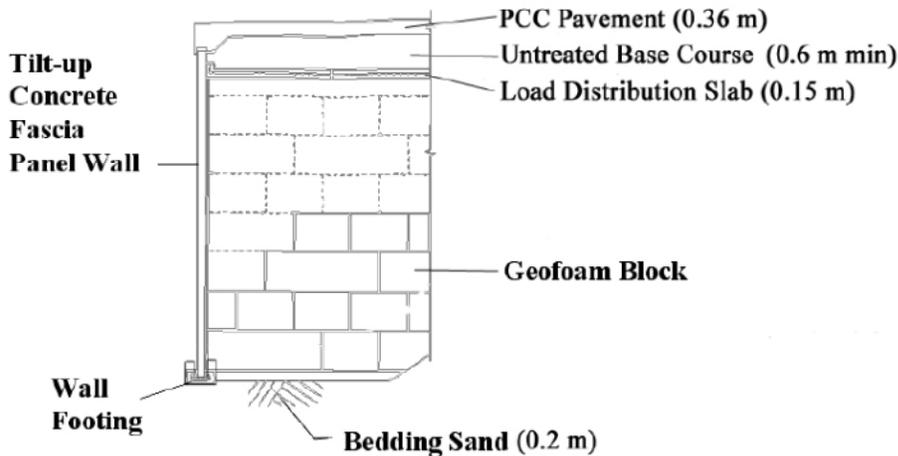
Typical EPS-block gefoam cross-section used for the I-15 Reconstruction Project (Bartlett and Lawton, 2008a).
